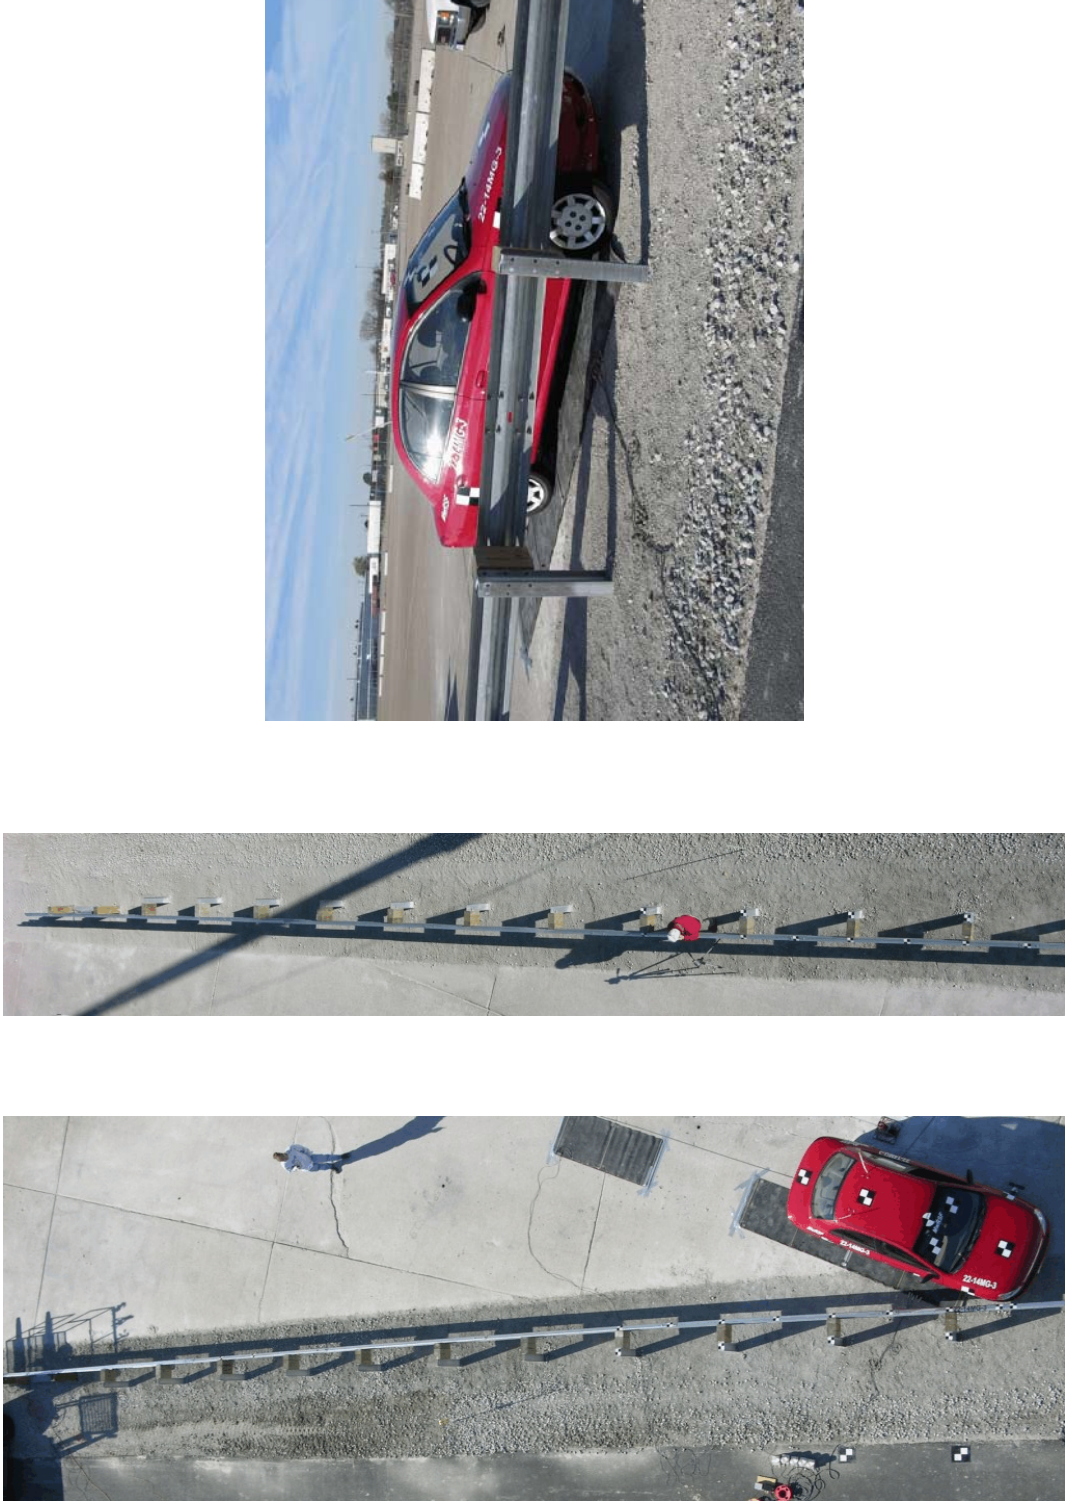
Midwest Guardrail System - Maximum Height Tolerance
